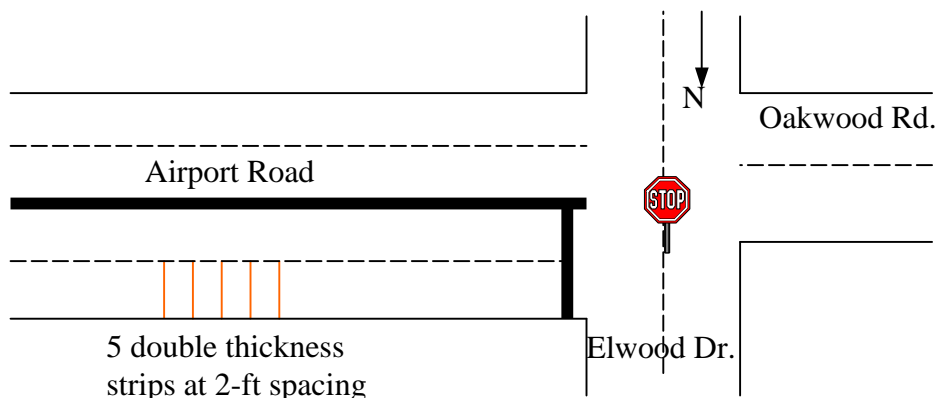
Rumble strips layouts – Airport Road – Site C (concrete pavement).
